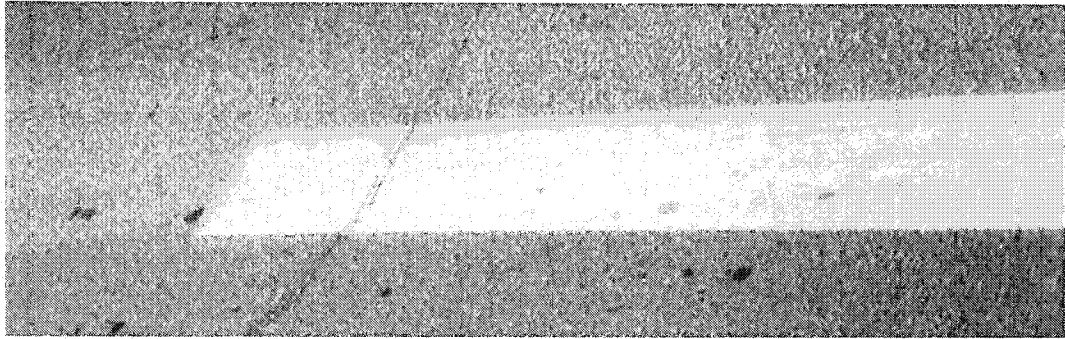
Transverse Cracking of the Asphalt Concrete
